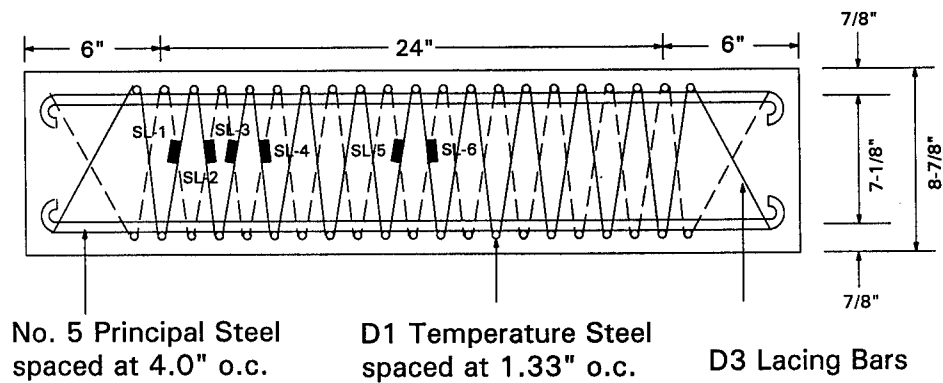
Strain Gage Locations on Lacing in Slabs No. 11 and 13
